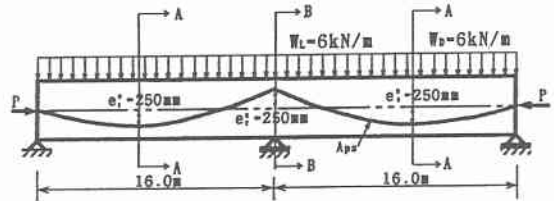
The geometry and loading condition of 2-span continuous prestressed concrete beam
